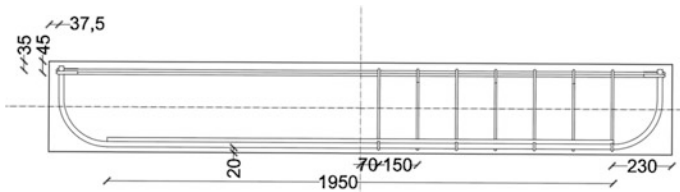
Transverse reinforcement arrangement. Dimensions in mm
